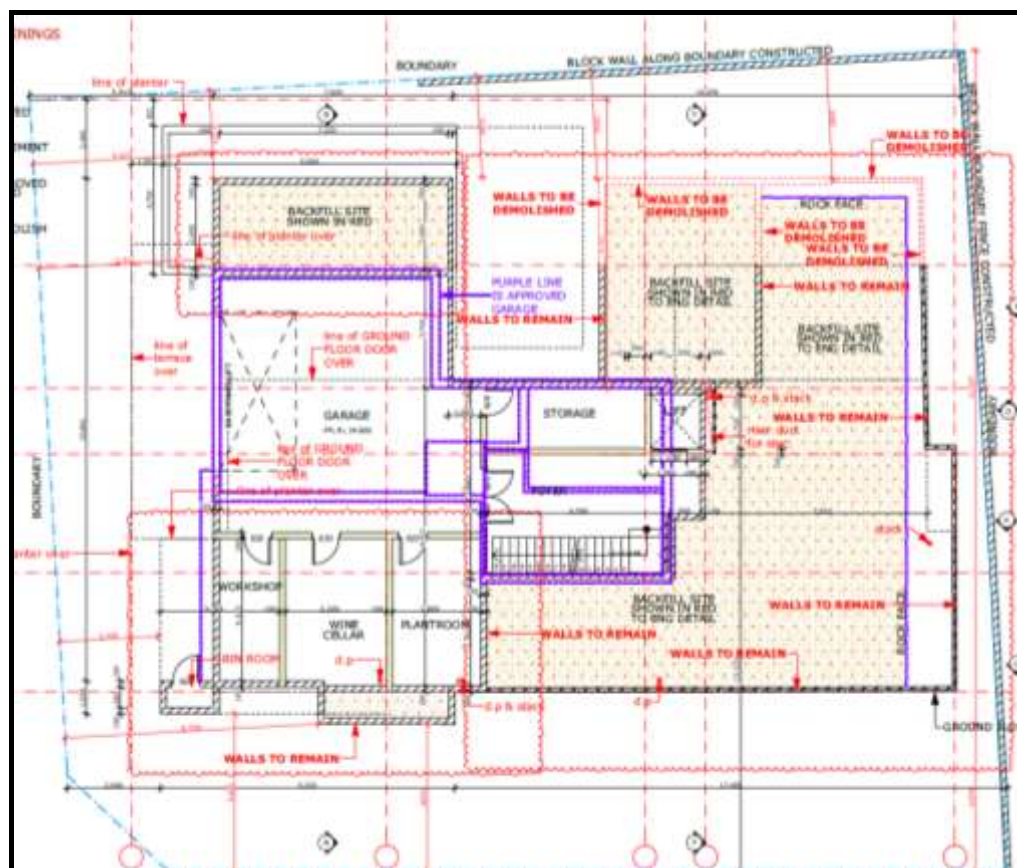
Proposed Basement Plan outlining walls to be demolished and walls to remain (Source: Issue L - David DeChiara, 24/5/2022)
